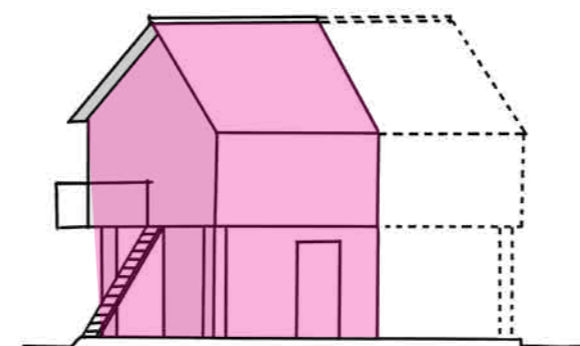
Core space arrangement (single room 4mx4m, floor raised to have ample space underneath for People with Disabilities, a gable roof, dotted line shows possibility for future extension).
